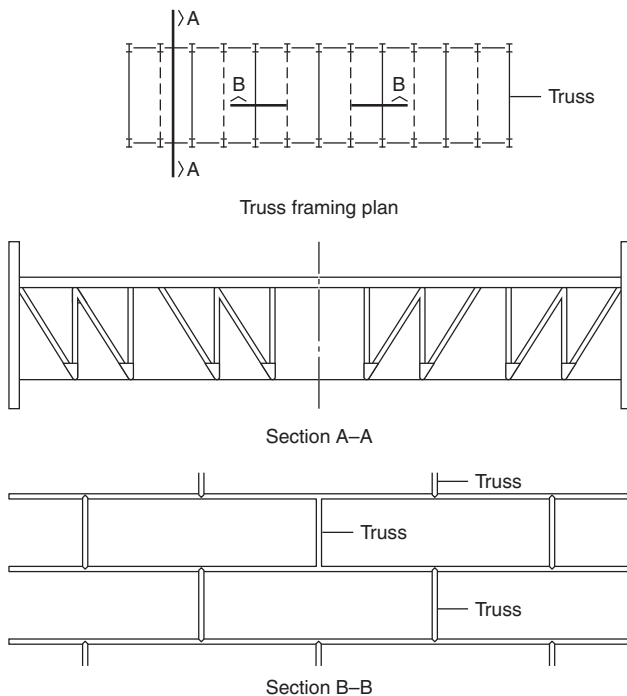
A typical truss and positionings in a staggered truss system.³³
